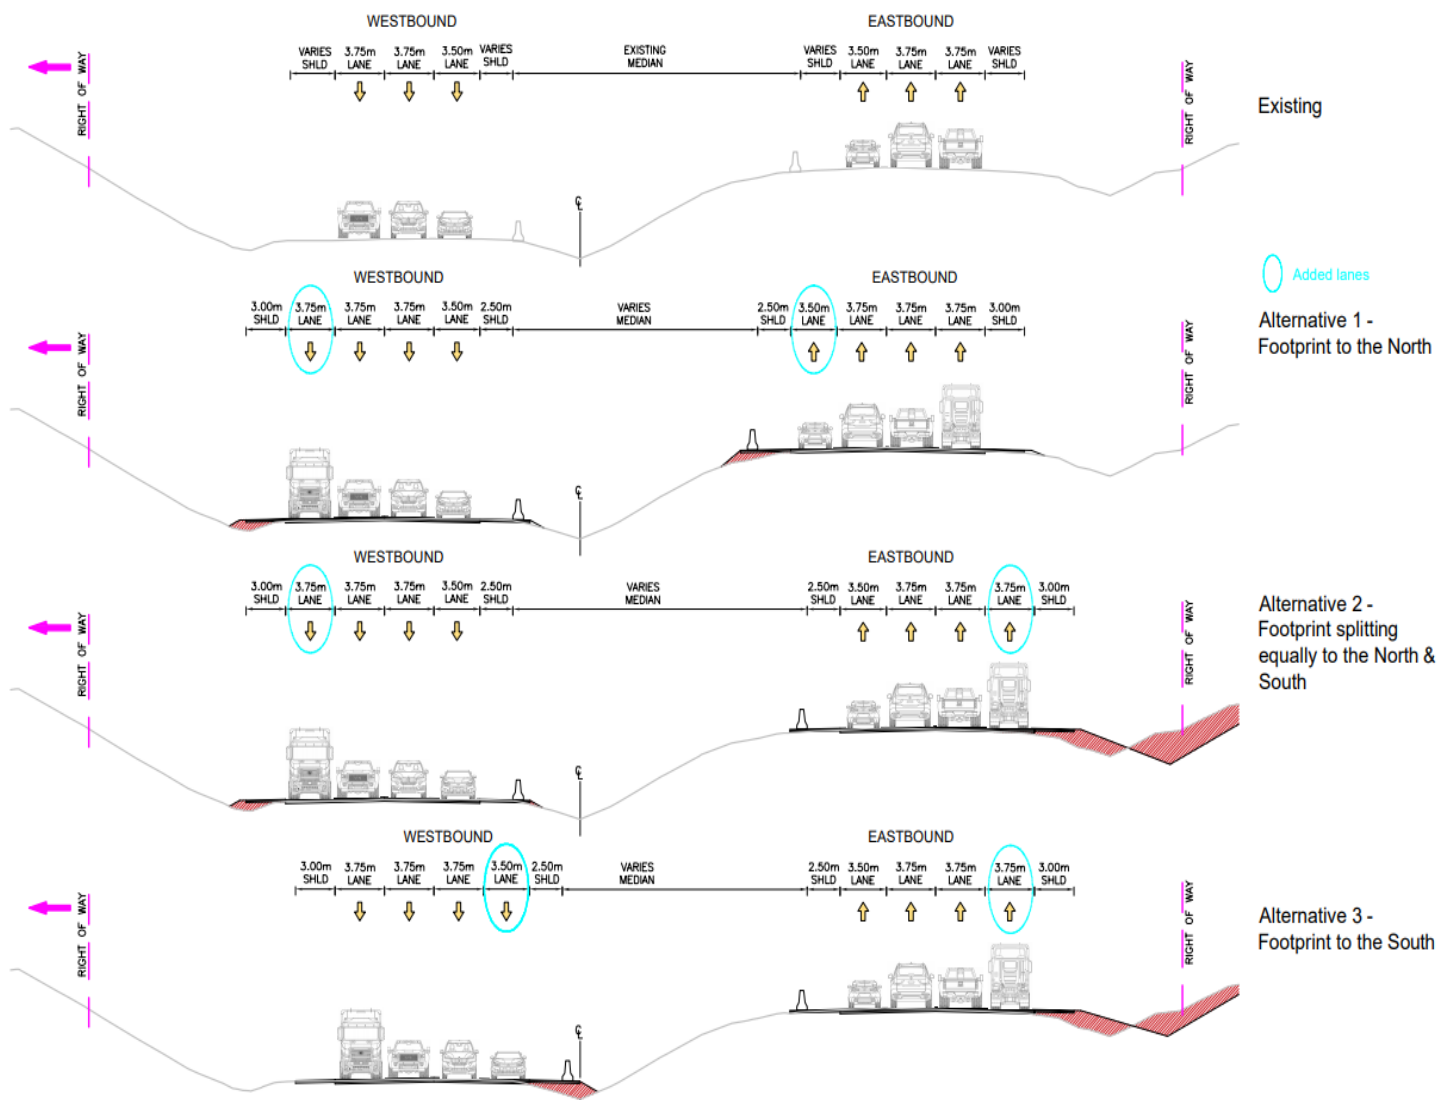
Section 2 – Existing Cross-Section and Future Footprint Alternatives Considered
